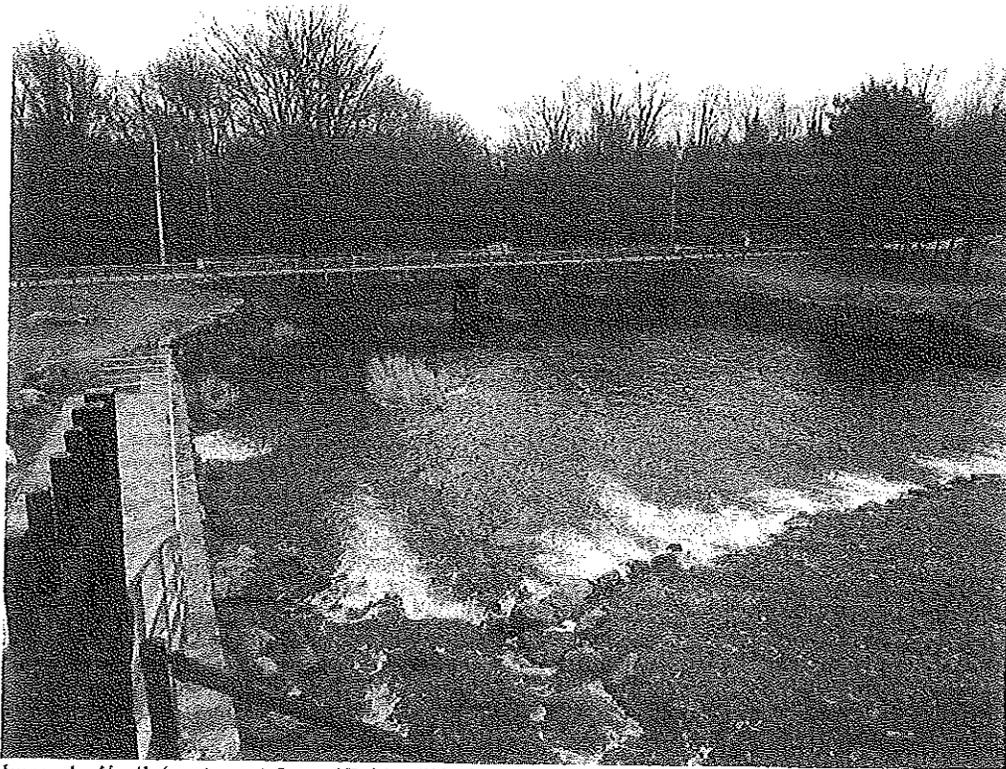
North (upstream) face of Bridge #02866, viewed from the Eagleville dam.
